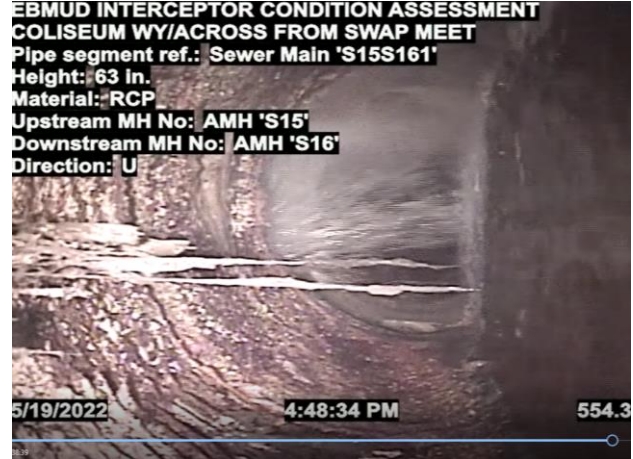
Missing reinforcing steel and wetness at crown of pipe up to approx. 10 feet downstream of S15
